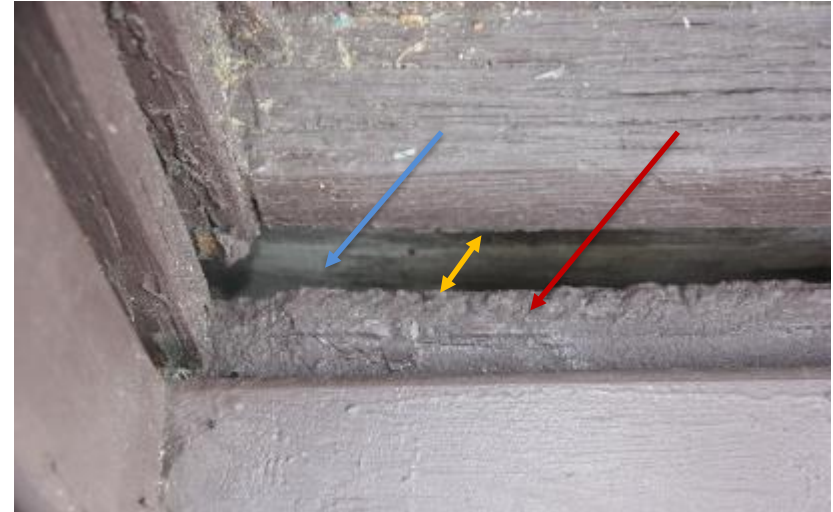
Black Bear Inn. Looking down at gap (orange line) between concrete windowsill (red arrow tip) and wall substrate (blue arrow tip) at first floor window of west facade.
